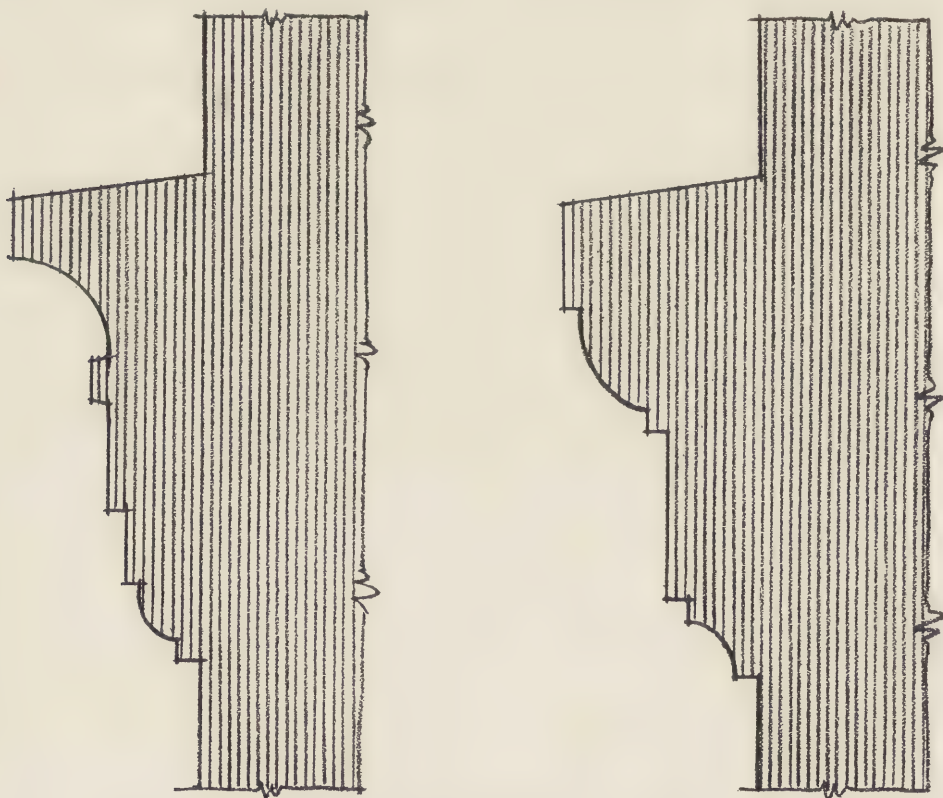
PROFILE OF BAND COURSES PROPOSED TO EMBELLISH CONCRETE BUILDINGS.
